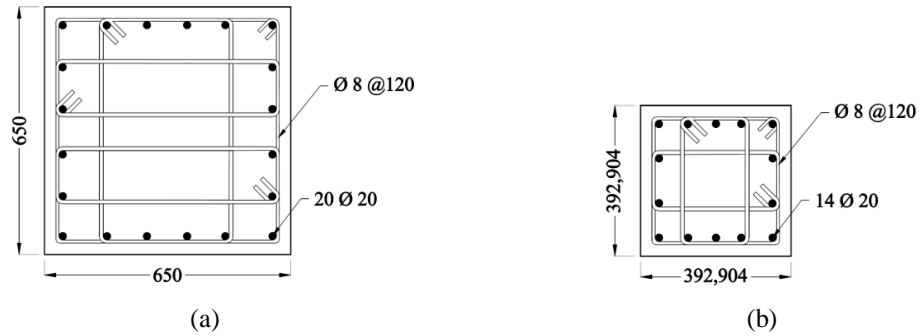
Columns cross-section details of the Modified 6 case of structure with eccentricity ratio equal to 0.284 (a) C1 and (b) C2, C3, C4 (all dimensions are in millimetres).
